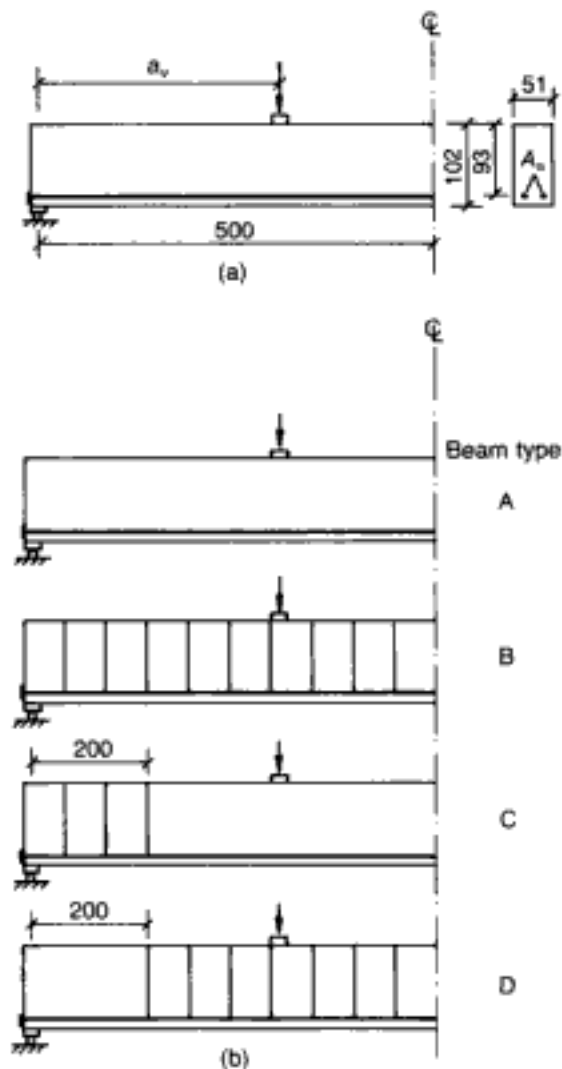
RC beams with values of a_v/d greater than 2.5 under two-point loading:¹¹³
